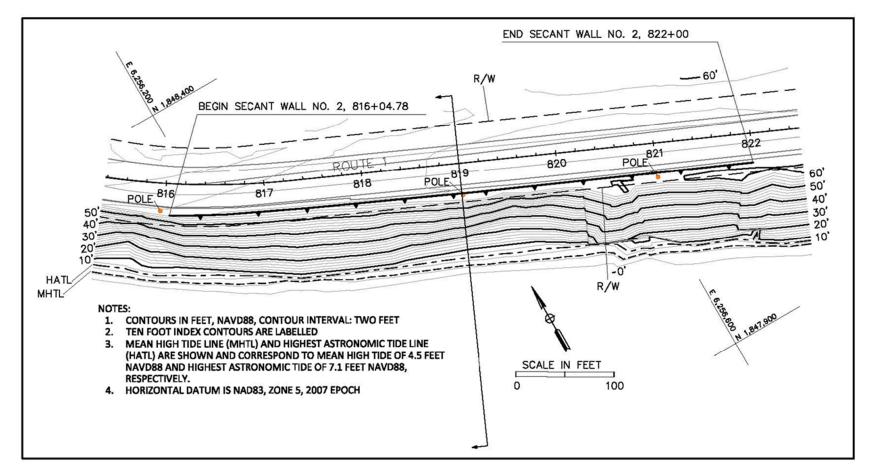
Plan view of the proposed secant wall and surrounding topography at PM 4.0.
